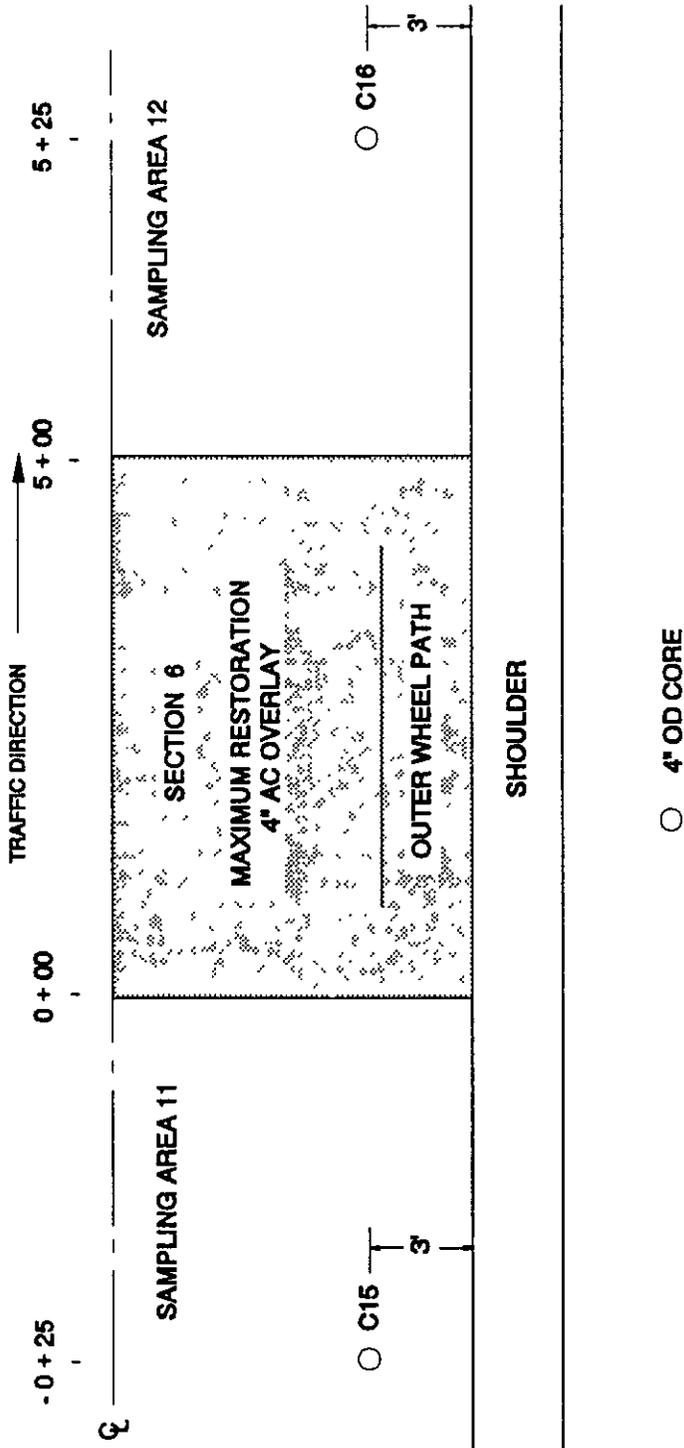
Example of "Pre-Construction" Sampling Plan for test Section 6
